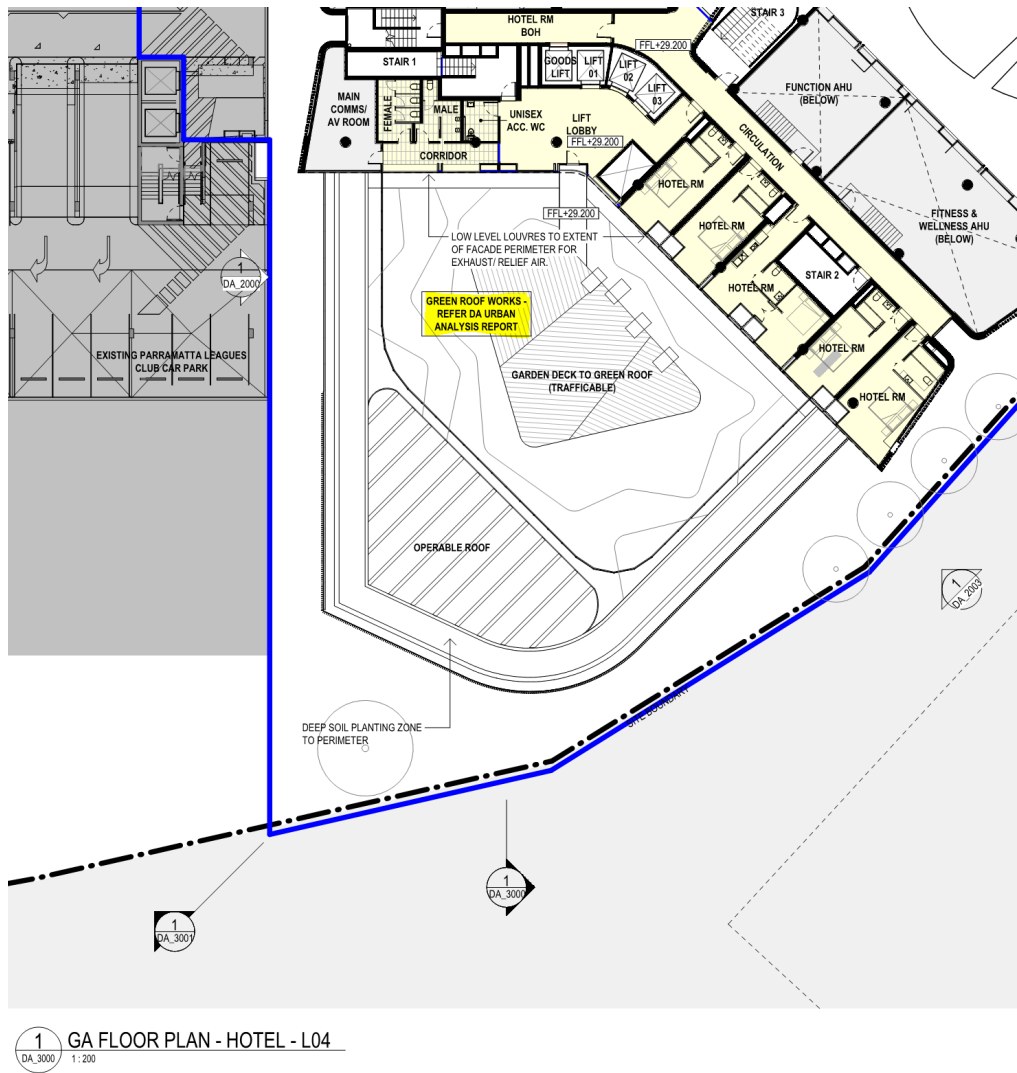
(Above) - Extract of GA Floor Plan Level 4 - Garden Terrace with Green Roof Location (Hassell, Design Report)
